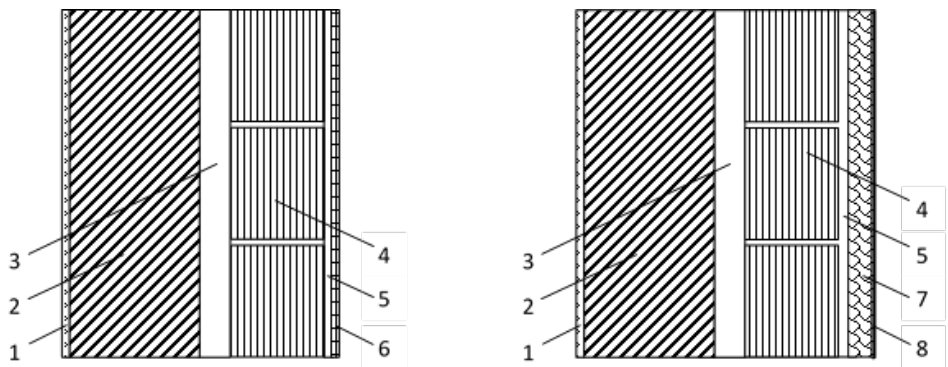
External wall details: 1- internal plaster; 2 – reinforced concrete; 3 – unventilated air layer; 4 - masonry units with vertical holes; 5 – cement mortar; 6 – marble mosaic; 7 - expanded polystyrene (EPS) insulation; 8 – external plaster
